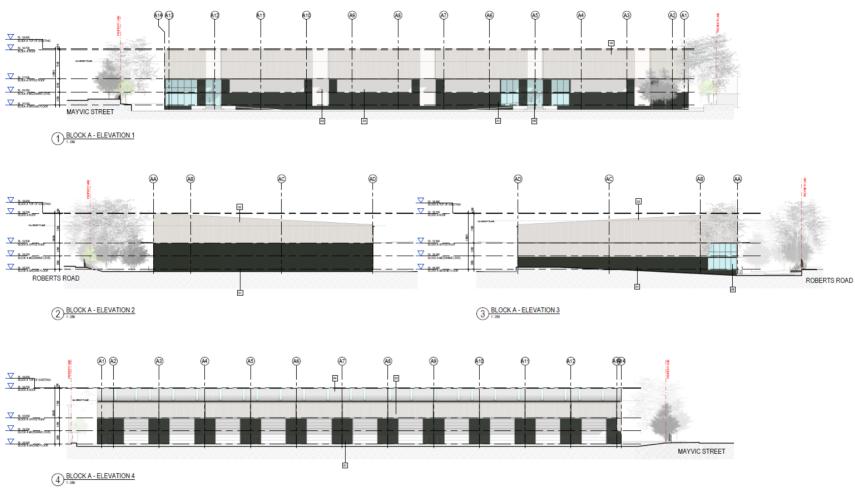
Warehouse A elevation showing proposed building height compared with existing 12m height control (Source: Group GSA)
